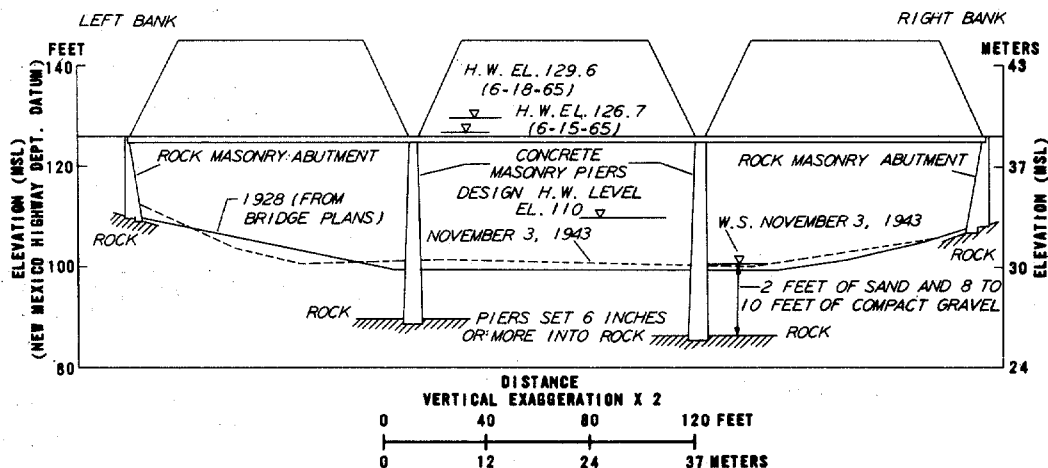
Cross section of Canadian River at SR-65 near Sanchez, New Mexico in 1928 and 1943.
